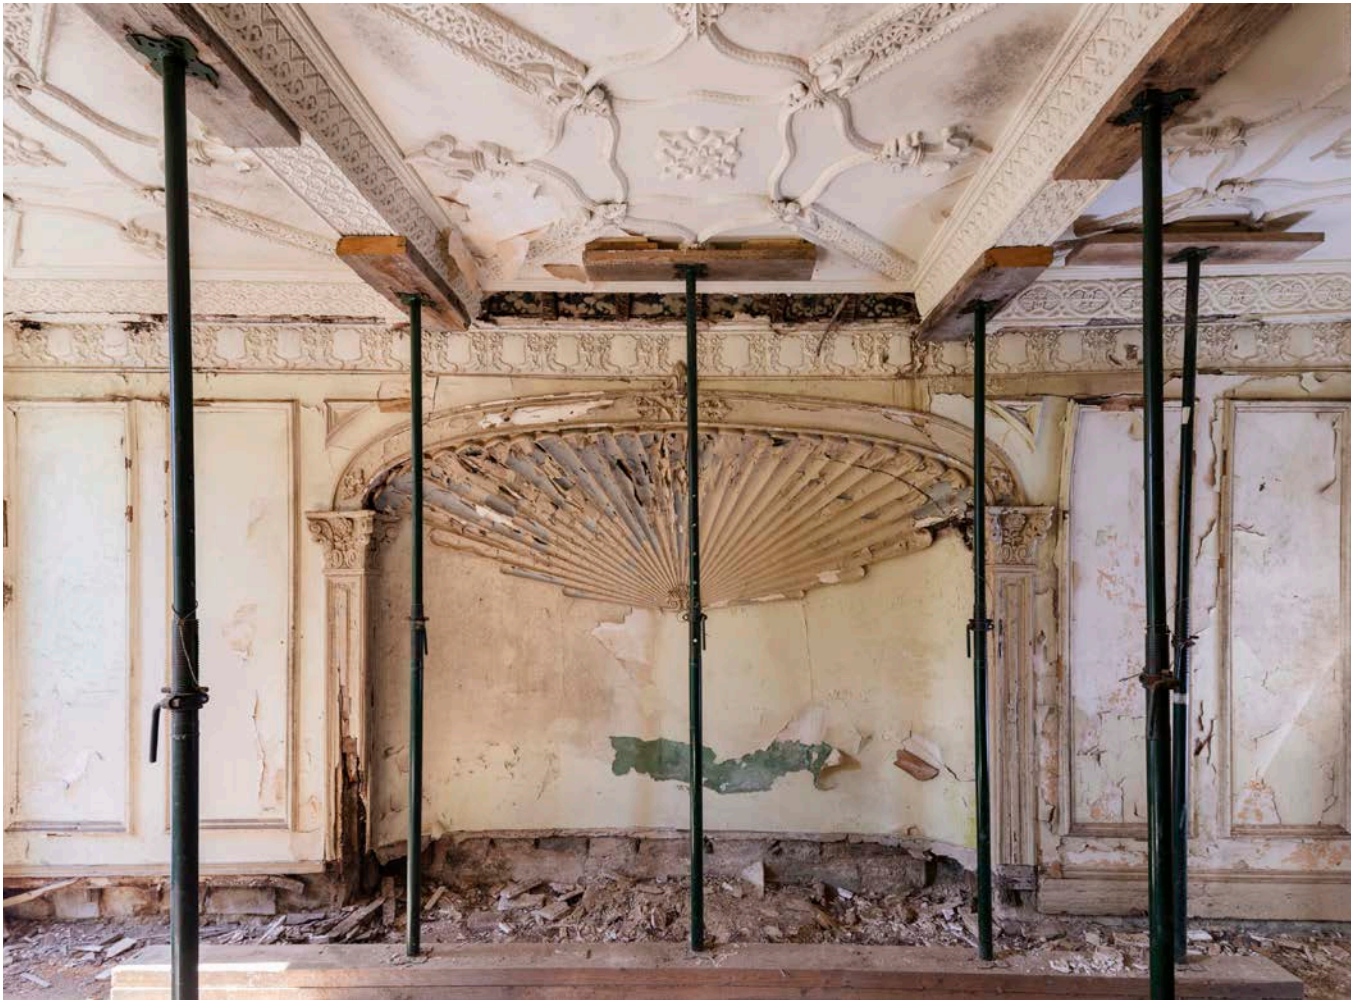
Ceiling support using timber bearing plates top and bottom at Withcote Hall. © Historic England Archive
